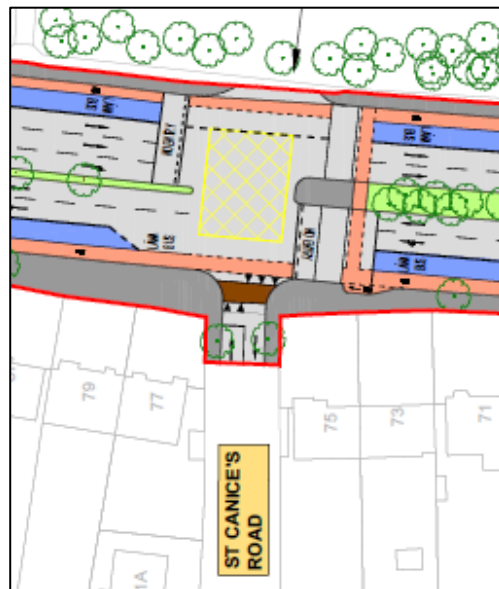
Proposed Junction Layout at St. Canice's Road
